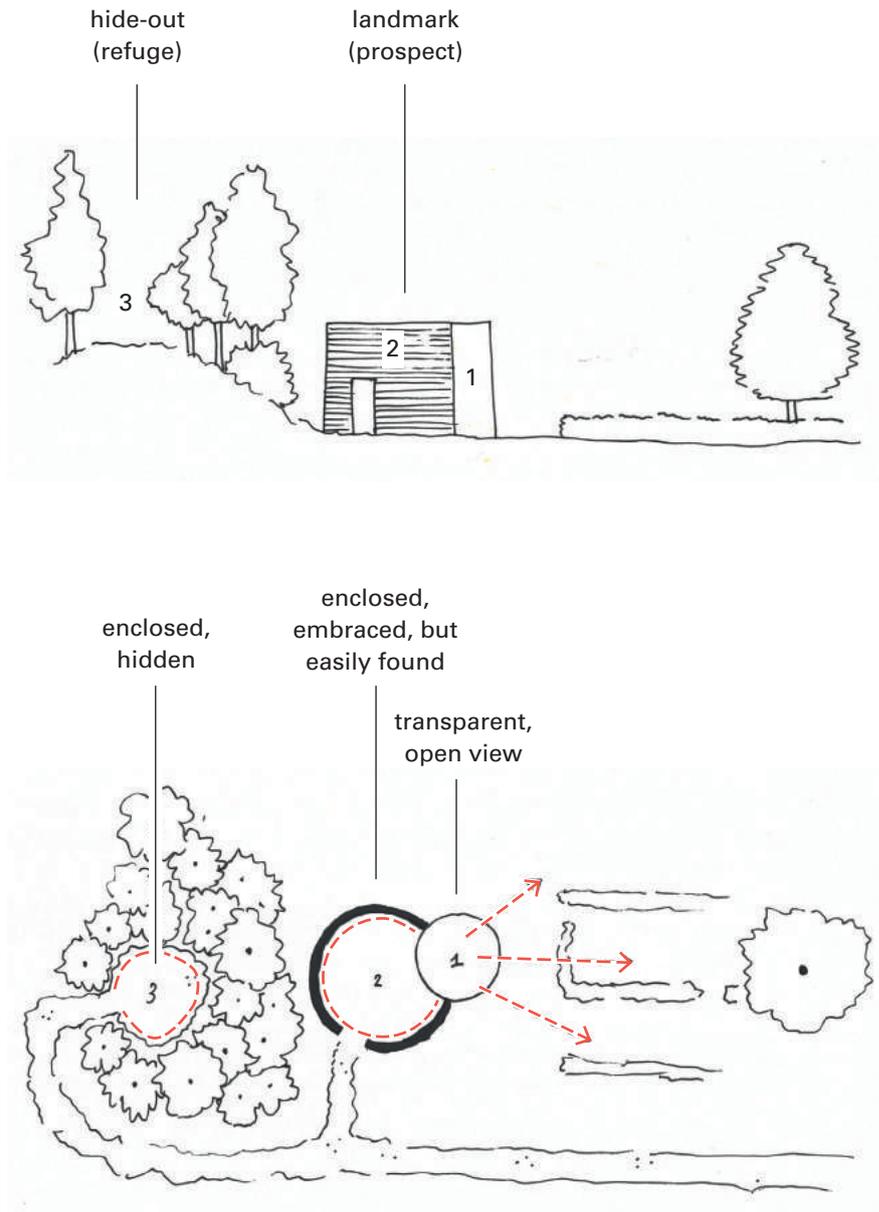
Scheme of section (top) and plan (bottom) of Graubner pavilion
